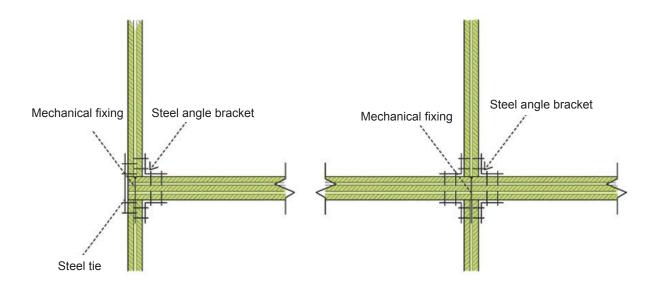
Typical external and internal wall to floor connection details Source: Waugh Thistleton Architects
